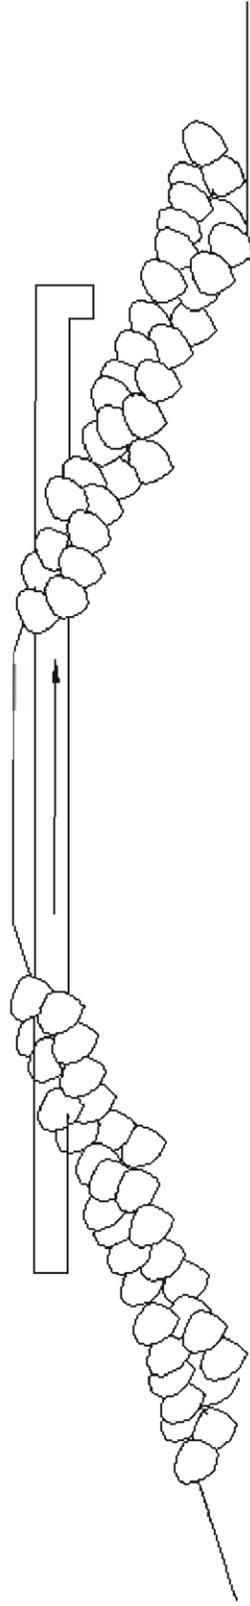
Proposed Sedimentation Pond Typical Cross-Section
